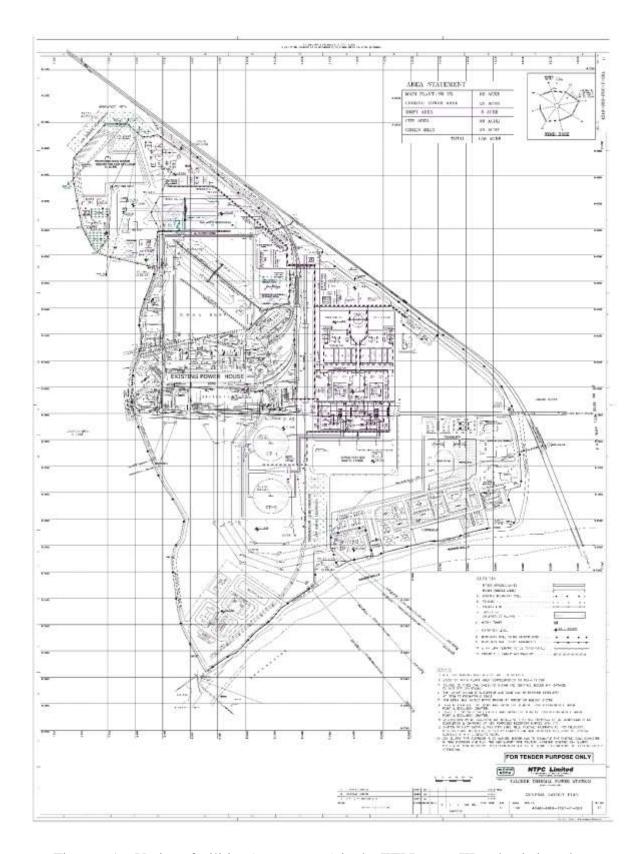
Various facilities (components) in the TTPP stage III and existing plant
